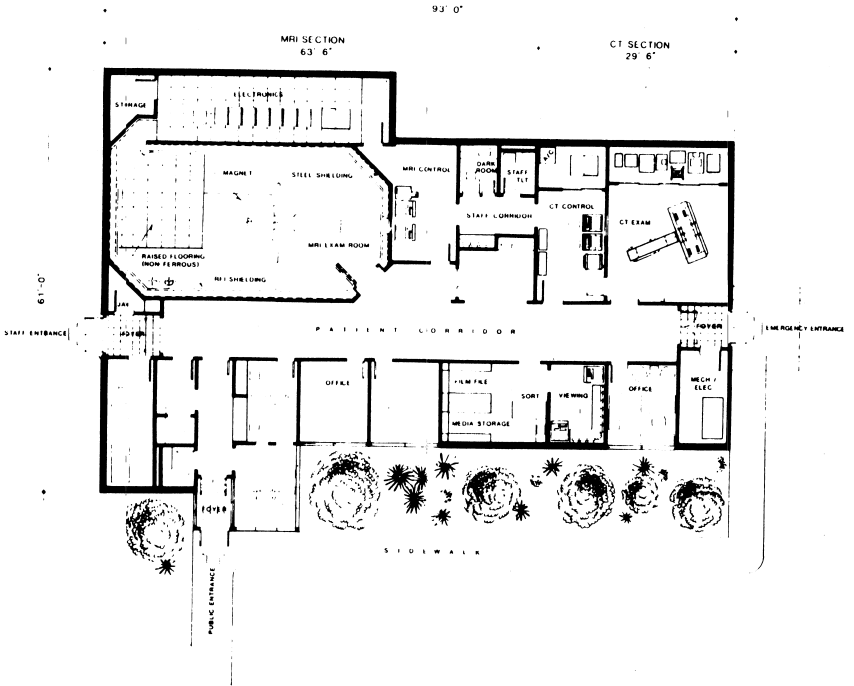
(c) Typical 1.0 to 2.0 T MR imager layout with accompanying CT facility.
